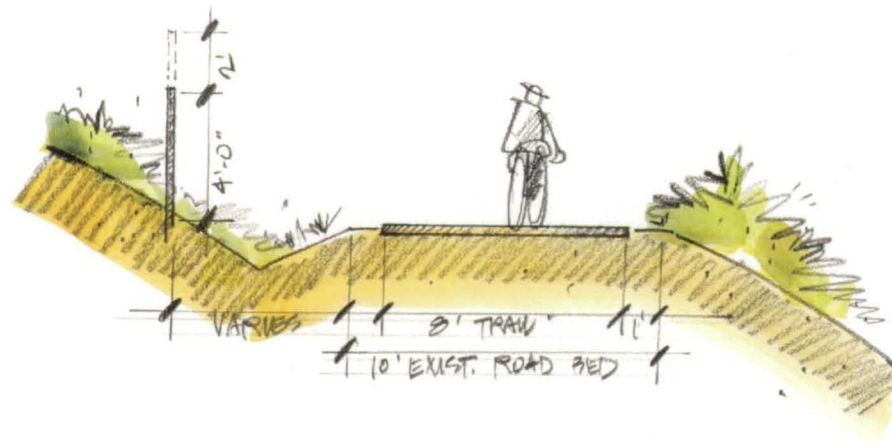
Paved Multi-Use Trail in Landfill on 10' Road Bed
